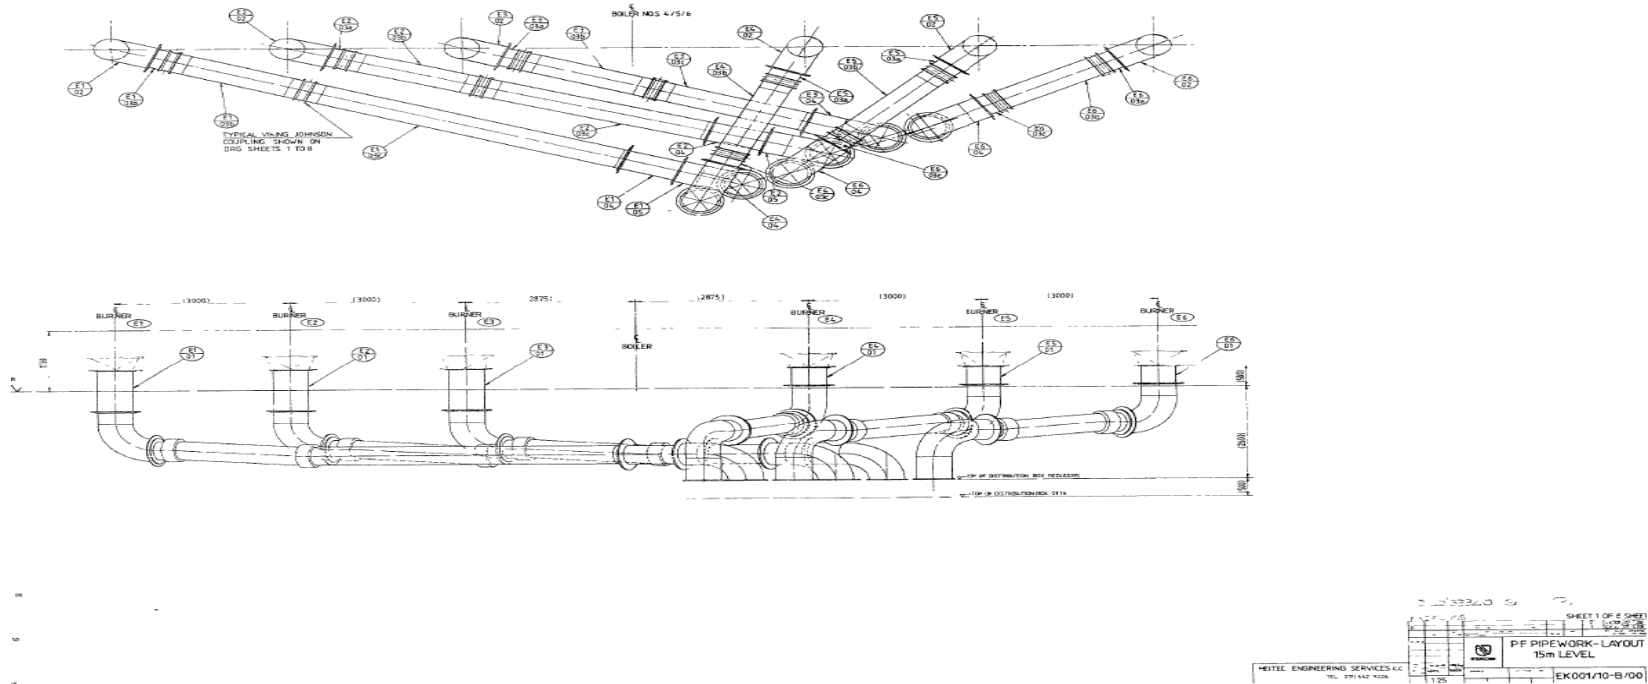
Unit 4-6 Mill E PF pipes arrangements and elevation around the boiler
